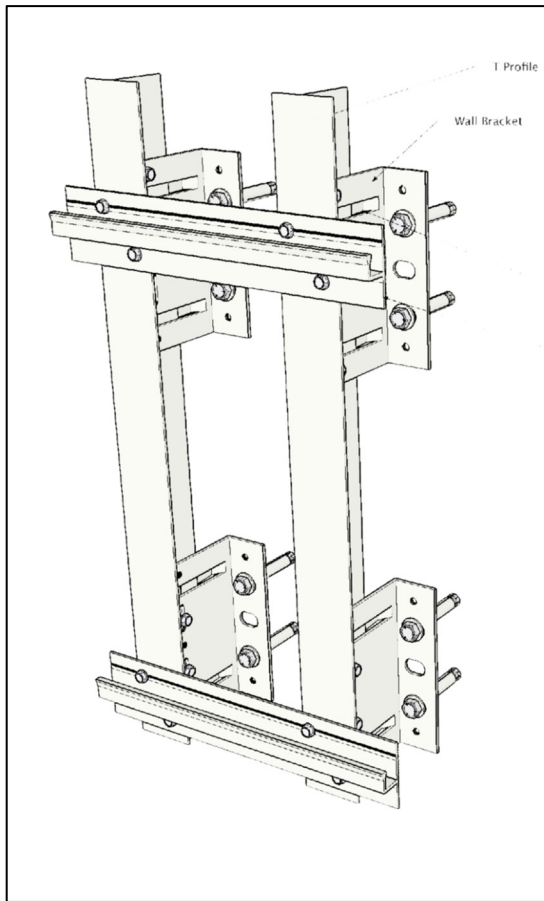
SUBSTRUCTURE ASSEMBLY
